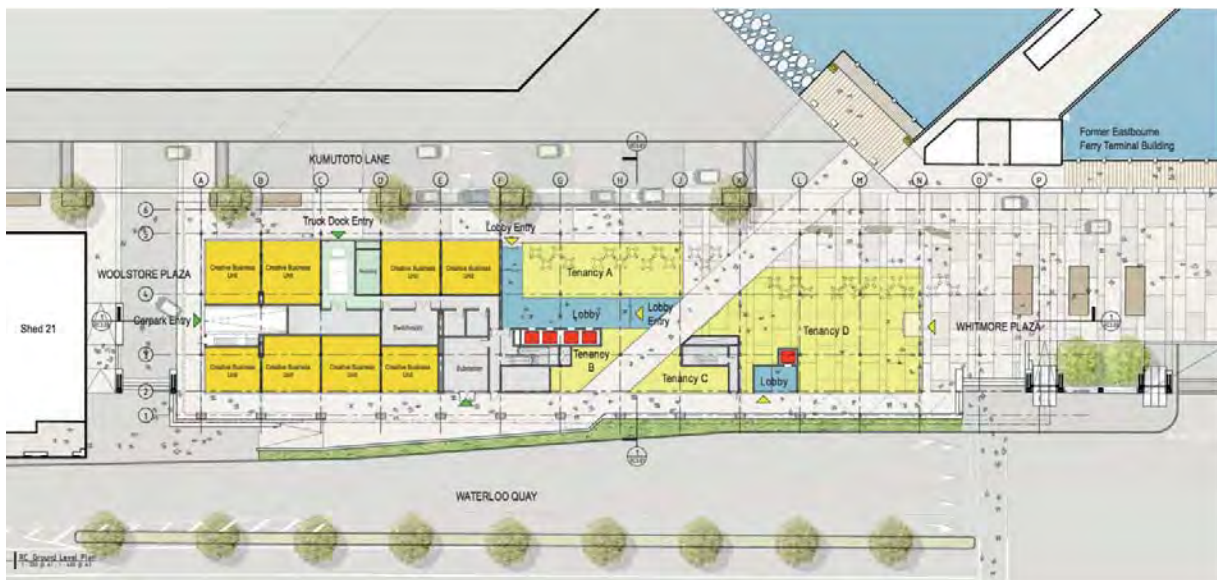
GROUND FLOOR PLAN OF PROPOSED BUILDING (FROM THE DOCUMENTS SUBMITTED WITH THE RESOURCE CONSENT APPLICATION)
